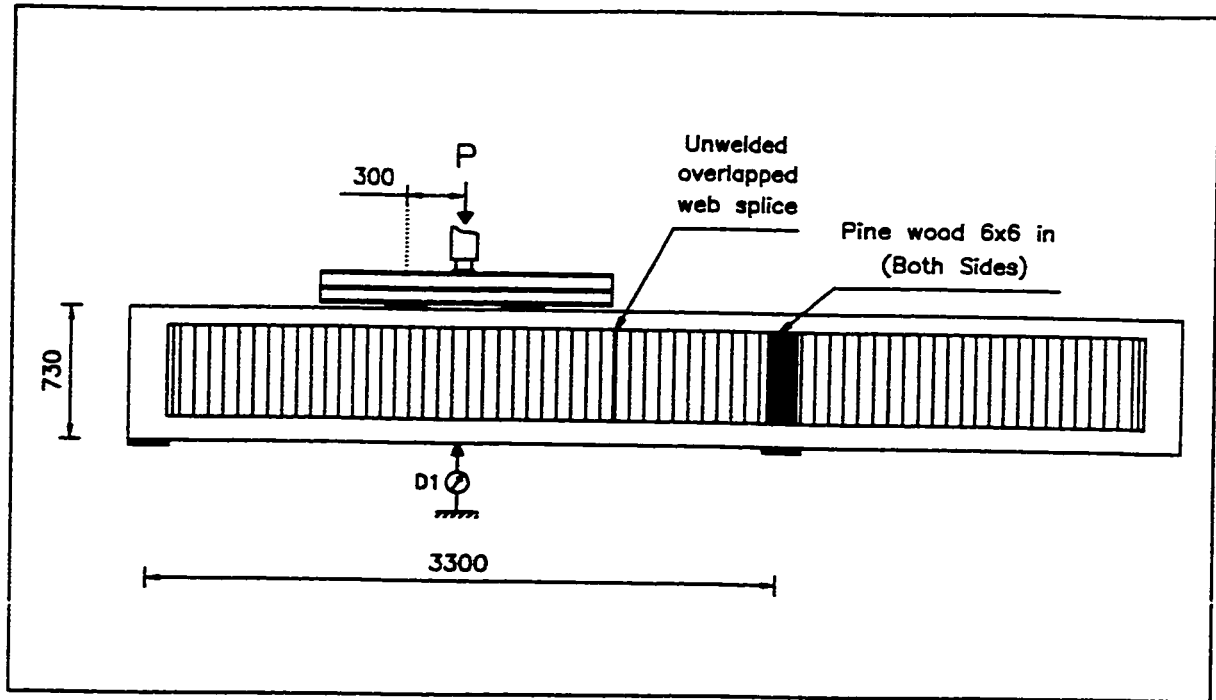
Loading setup and instrumentation, girder A-80-b
